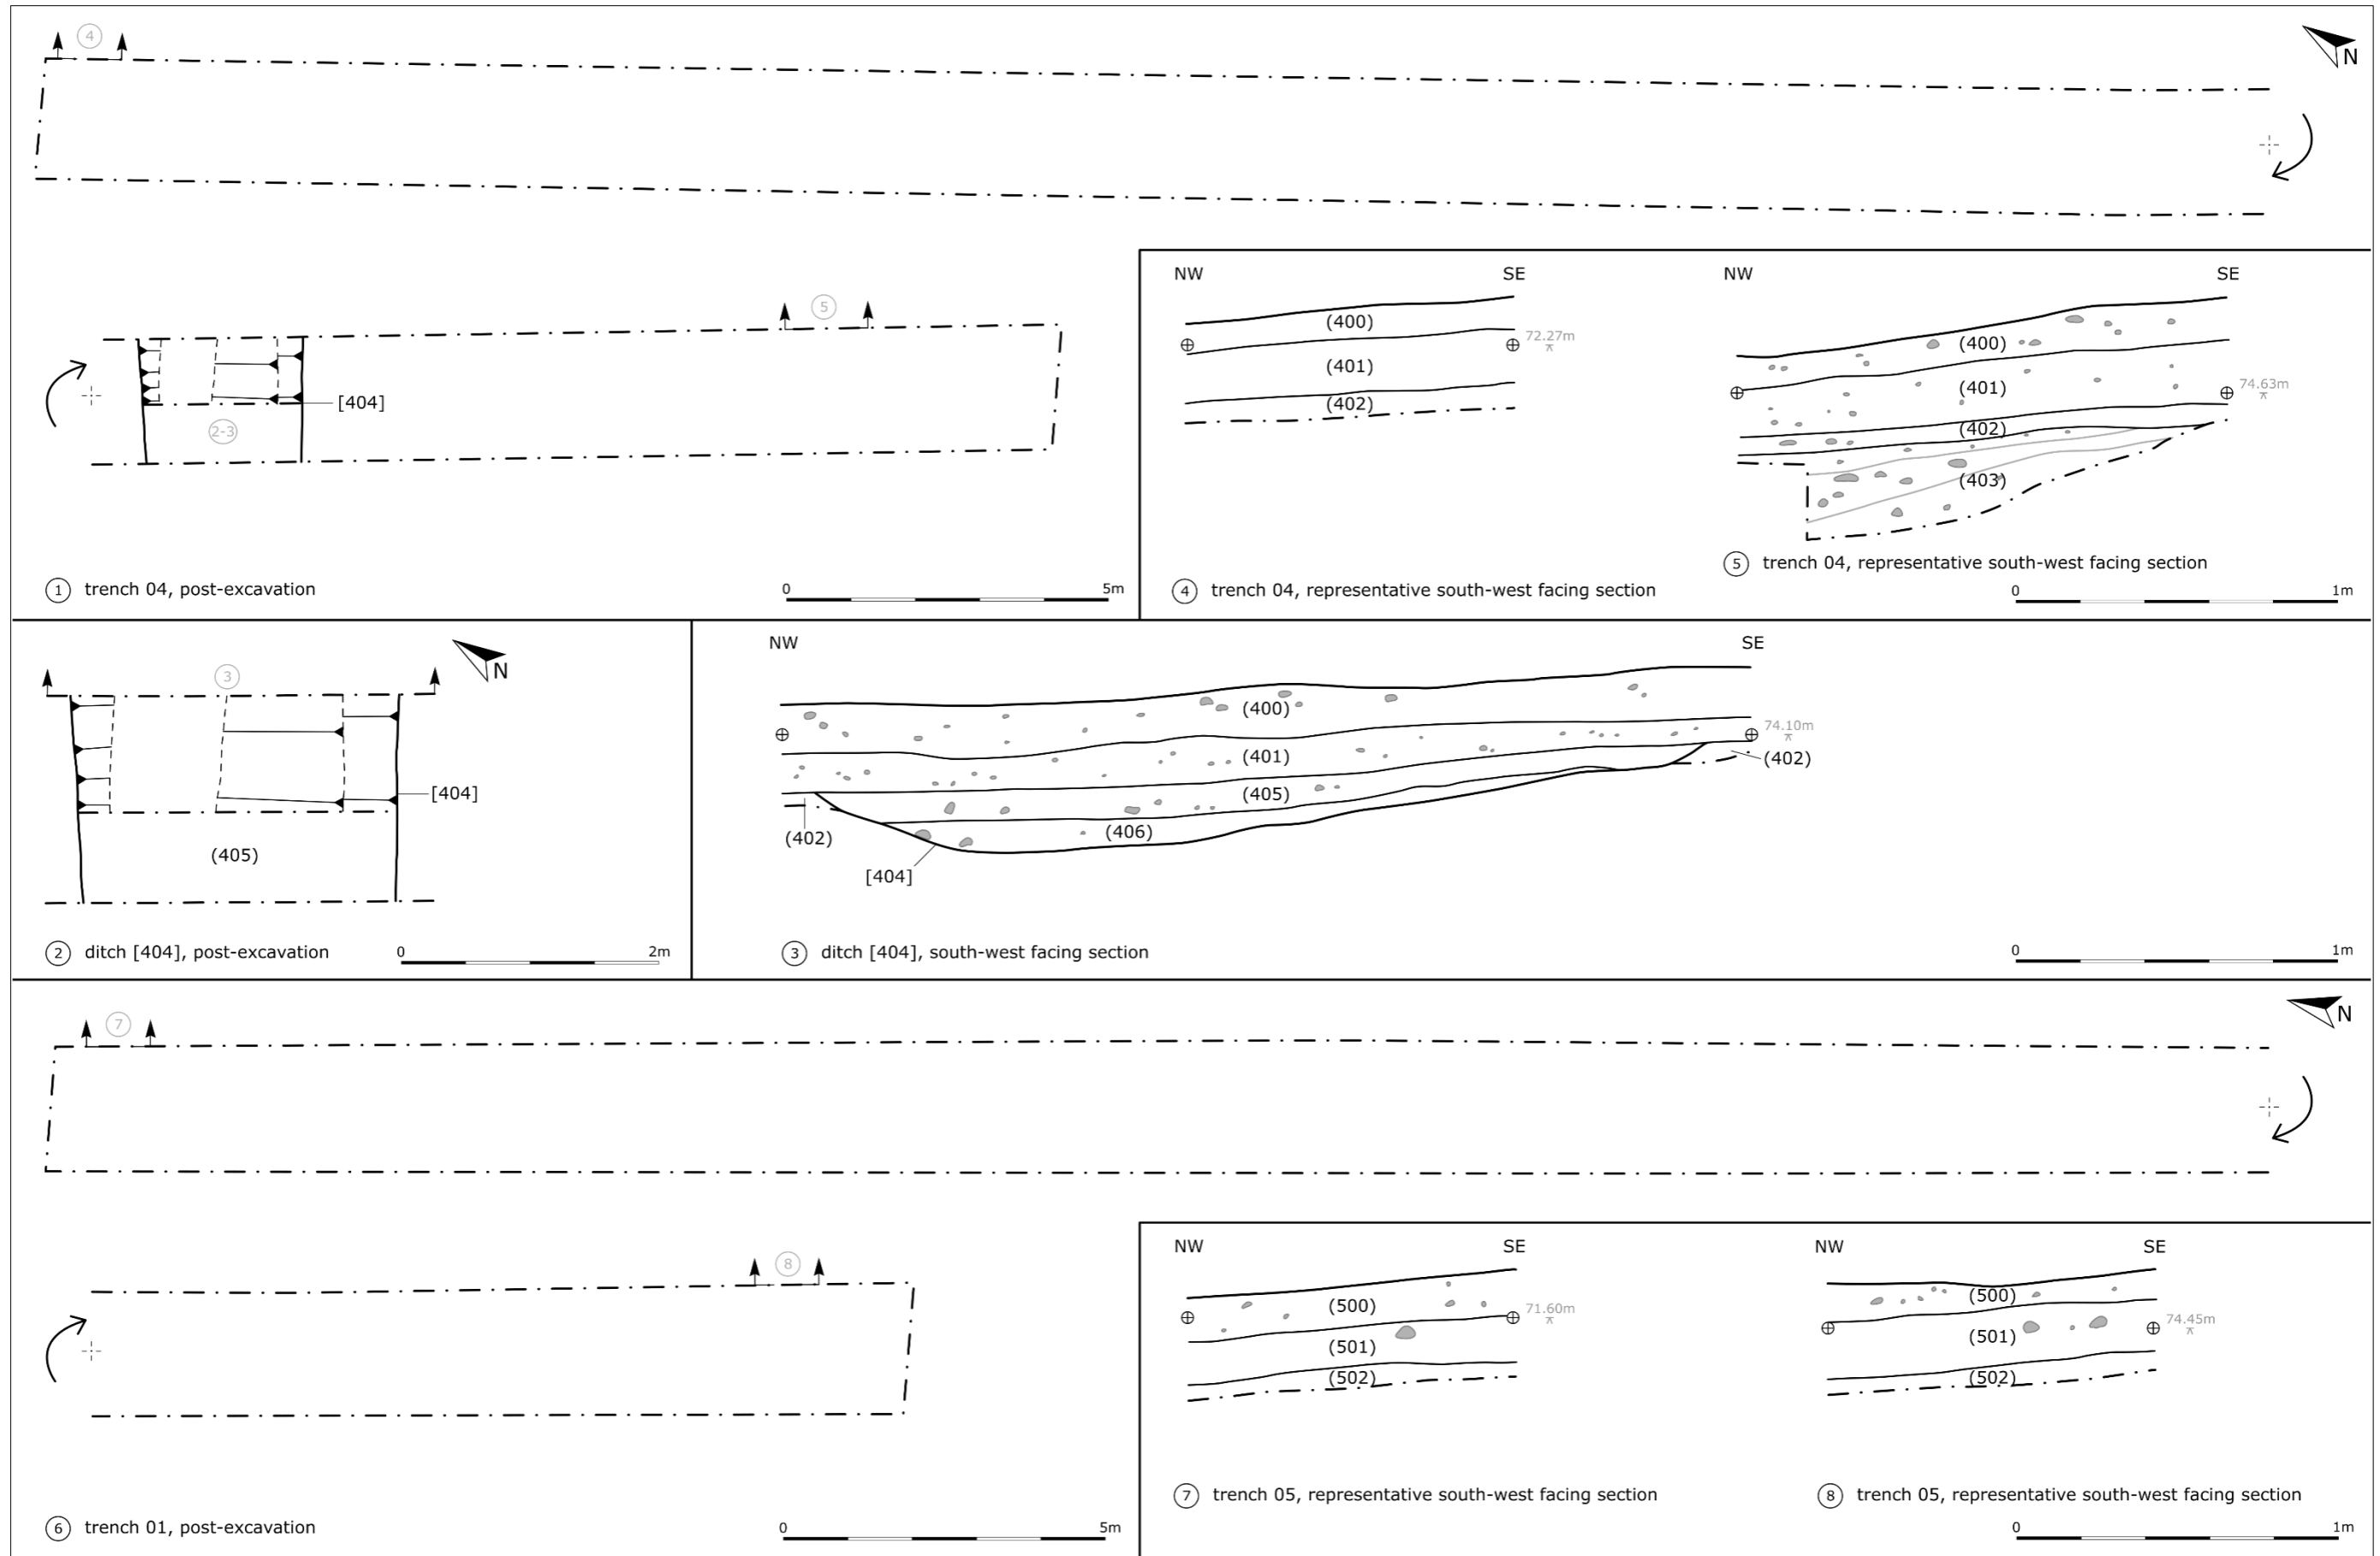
TRENCHES 04-05, PLANS AND SECTIONS. HEIGHTS AT AOD.
